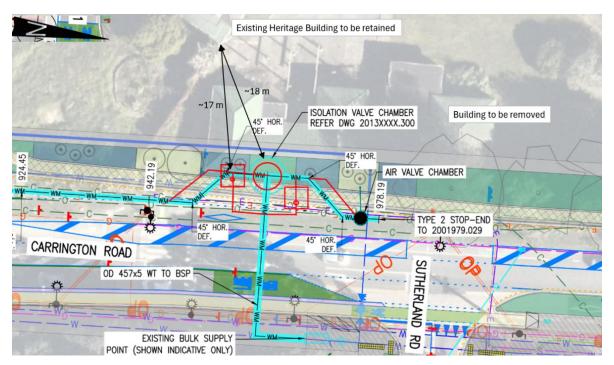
Excerpt of preliminary Carrington Road – Layout Plan and Pipe Longitudinal Section - Sheet 7 (DWG 2013XXX.208 Rev A) showing Isolation and cross connection valve chamber.
